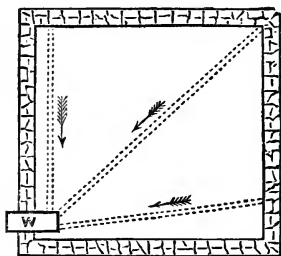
Plan of Underground Ice Vault—W, Well under wall; dotted lines, Drains to Well.
